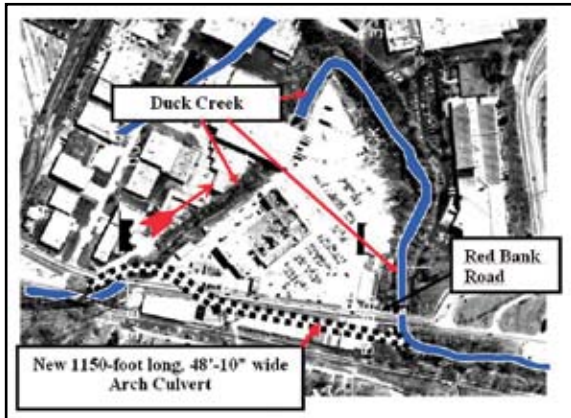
The Duck Creek Culvert eliminates an oxbow in an urban stream, and is constructed in a congested site bounded by a railroad track and an existing highway.
